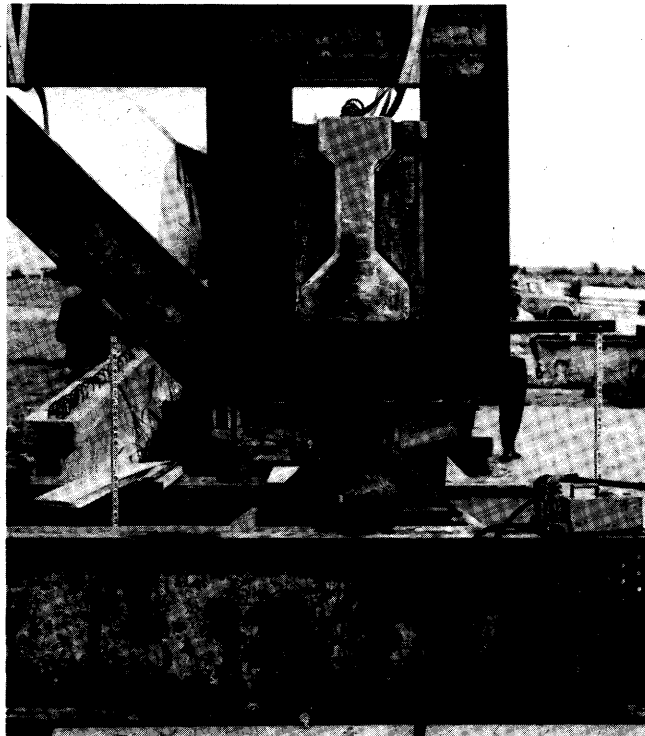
End view of testing frame showing scales used to determine rotational displacements of end of specimen.
